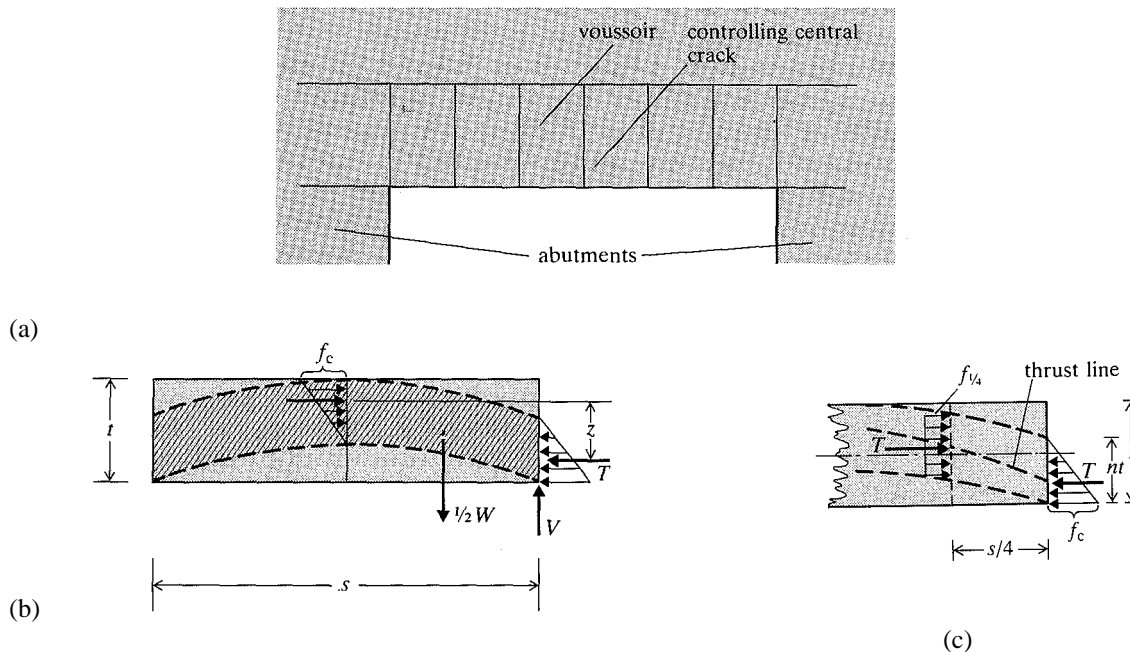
Voussoir Beam Geometry and Load Specification for Roof Beam Analysis (Brady and Brown, 1993).
